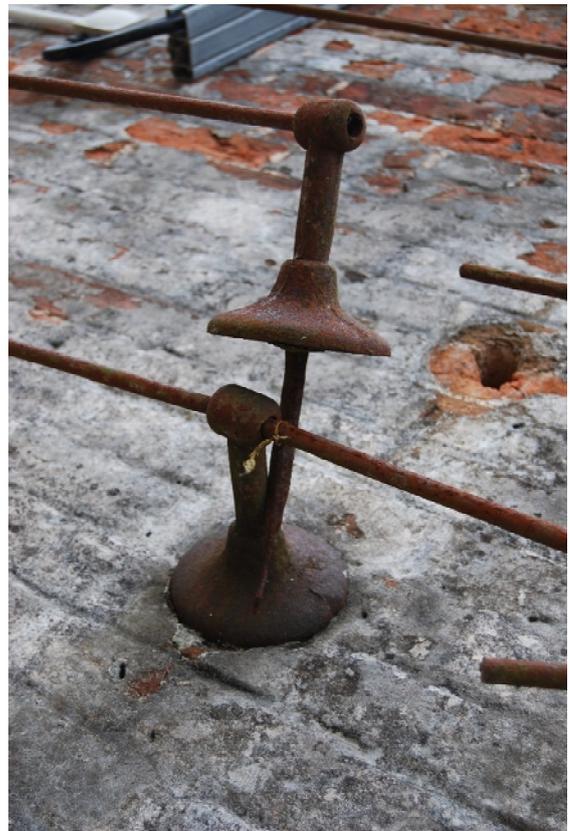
Fixings for vine ladders along back wall of central glasshouse
